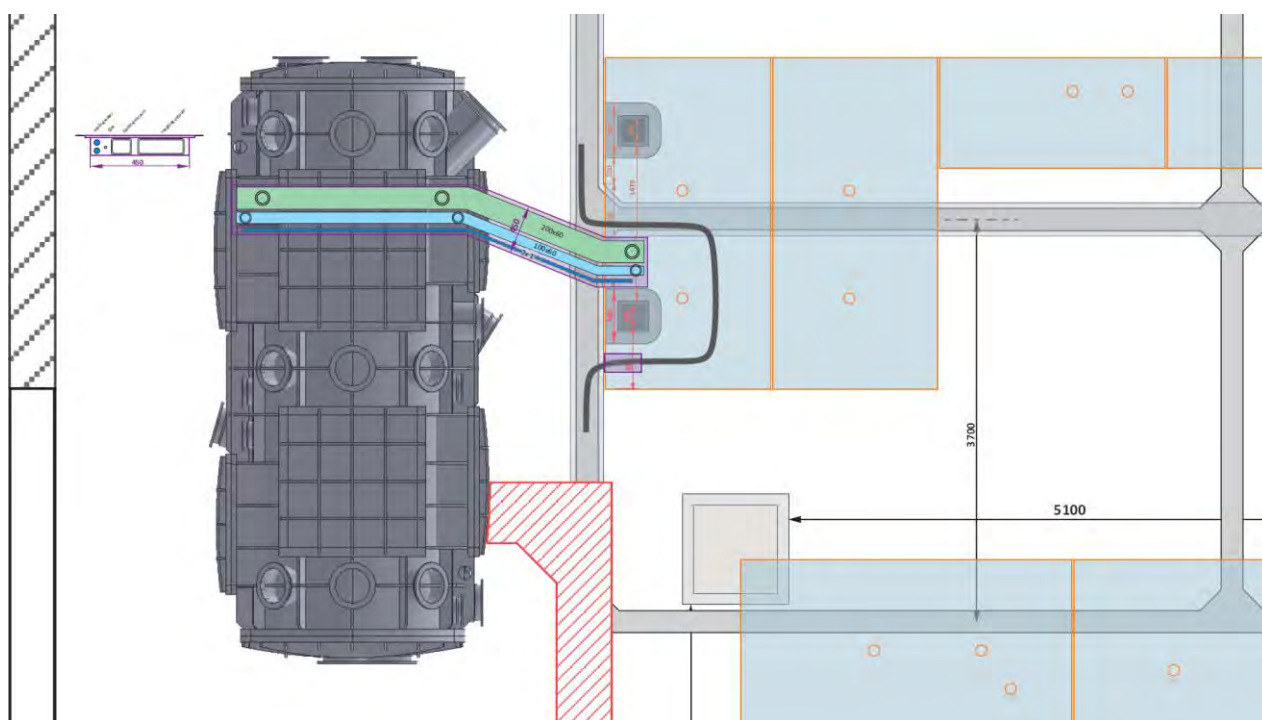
Layout of connection of the compressor chamber to L4b primary vacuum circuits (green: floor duct of the roughing vacuum, blue: floor duct of the backing vacuum). The ducts (rectangular floor tubes) will be provided and installed by ELI-Beamlines.
